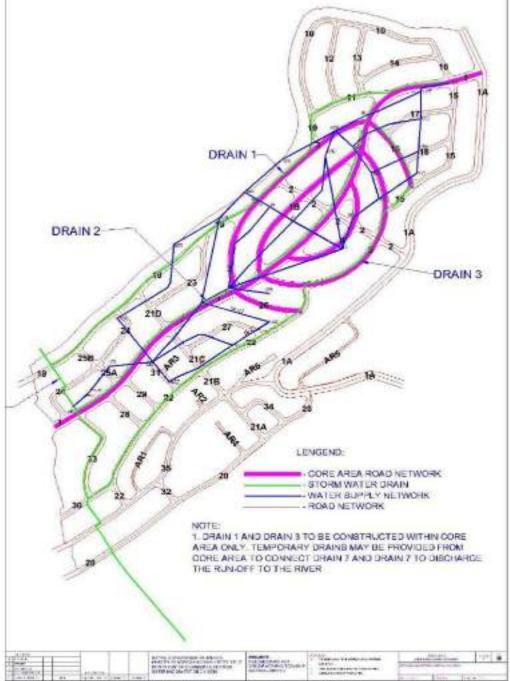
Layout of Proposed Storm Water Drains in Shechamthang (Ranibagan)
